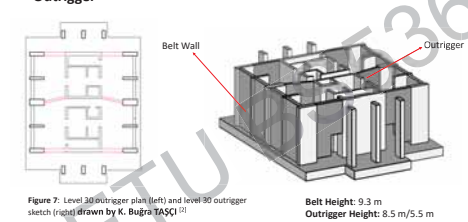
Level 30 outrigger plan (left) and level 30 outrigger sketch (right) drawn by K. Buğra Taşçı ^[2]
